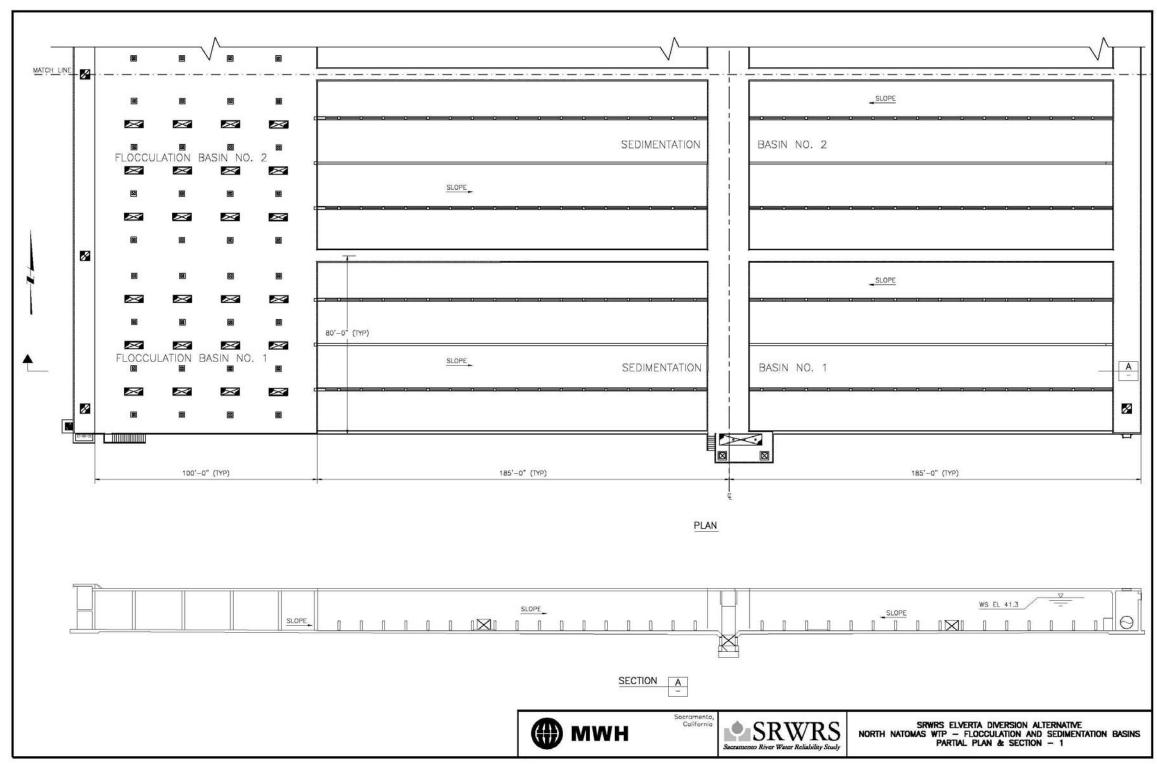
North Natomas WTP – Flocculation and Sedimentation Basins Partial Plan and Section-1
